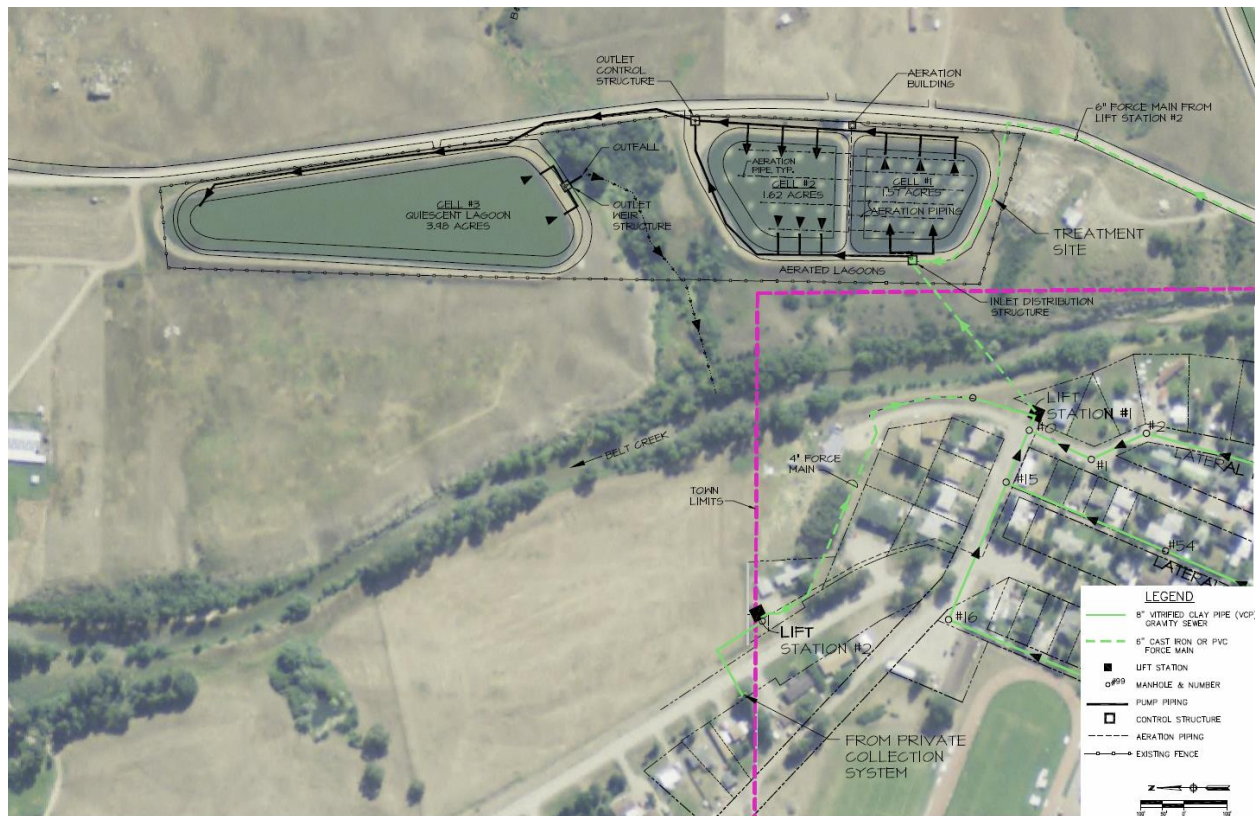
Plan View of the Treatment System (Courtesy of NCI Engineering).
